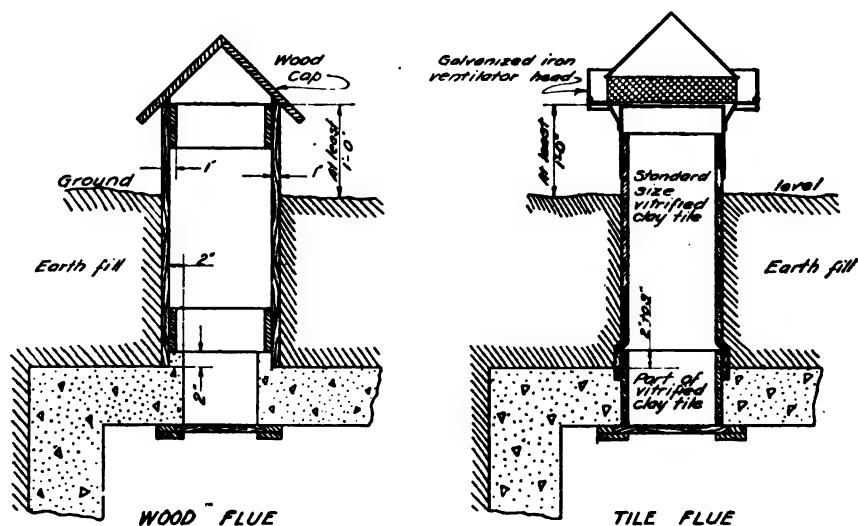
TWO POSSIBLE METHODS OF CONSTRUCTING THE OUTTAKE VENTILATOR FLUE IN A CONCRETE SLAB ROOF
